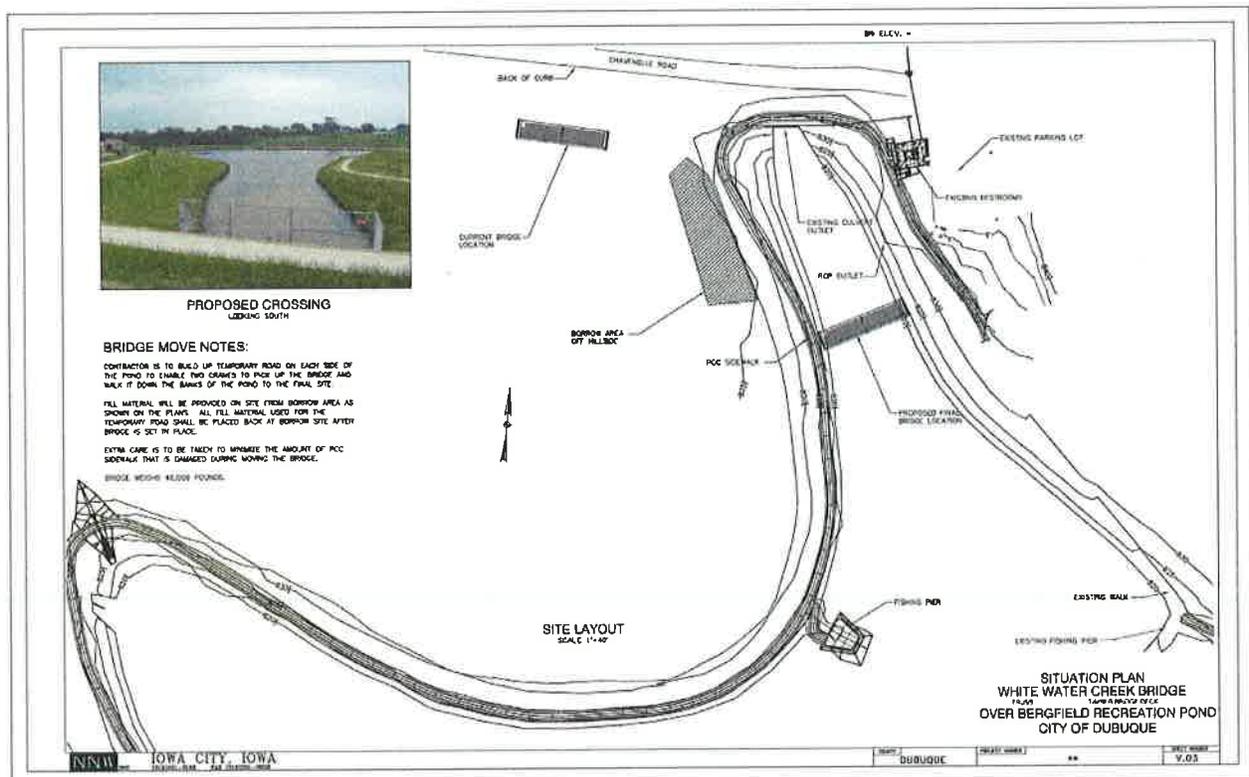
Situation Plan – White Water Creek Bridge over Bergfield (sic) Recreation Pond.
